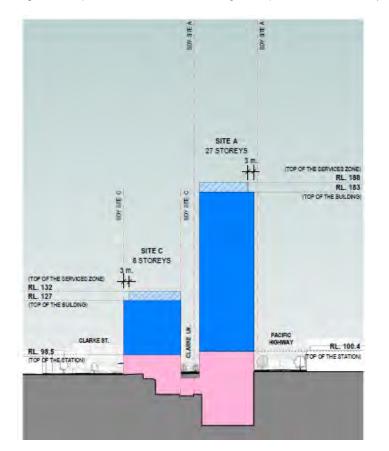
Proposed Crows Nest OSD building envelopes – cross section through the site (east-west)
